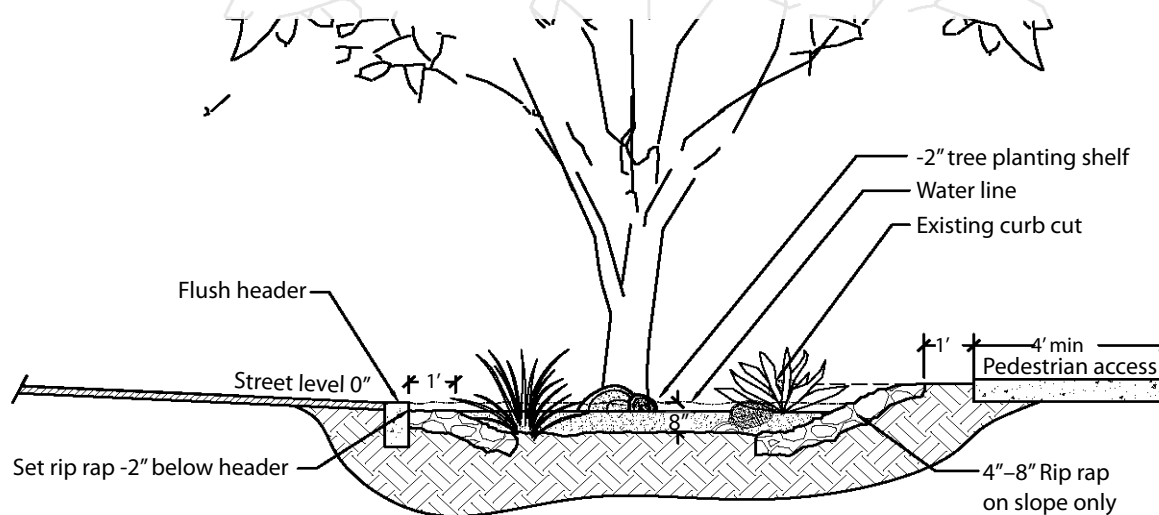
Section F. Typical cross-section of a chicane with flush curb and depressed bioretention area. For plan view, see Appendix.
